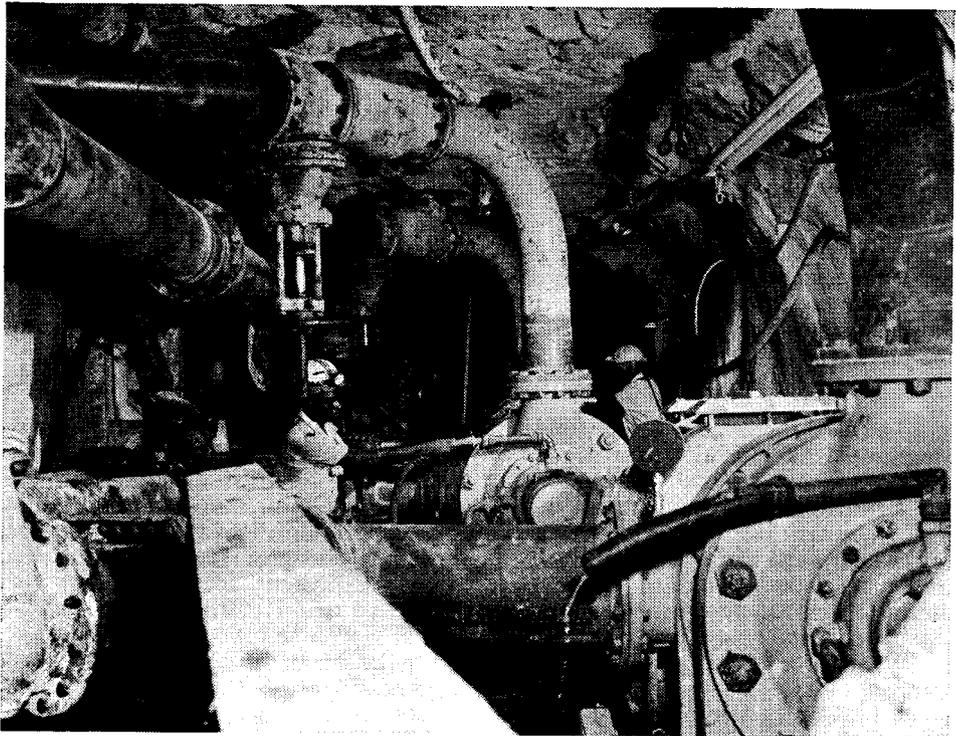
Emergency pumps installed on 20 Level station at No. 5A Sub-vertical Shaft
